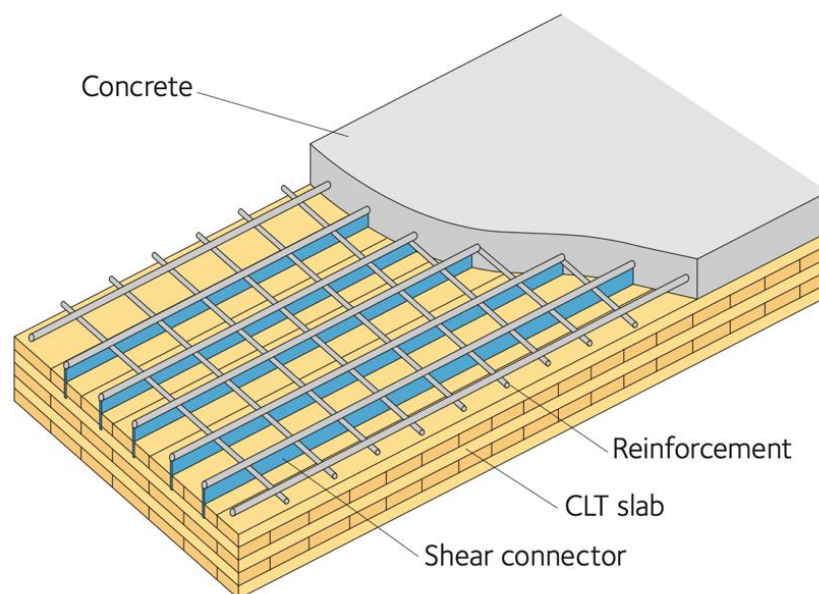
Composite floor structure in CLT and concrete, with shear fastener of type HBV [10, p. 93]
